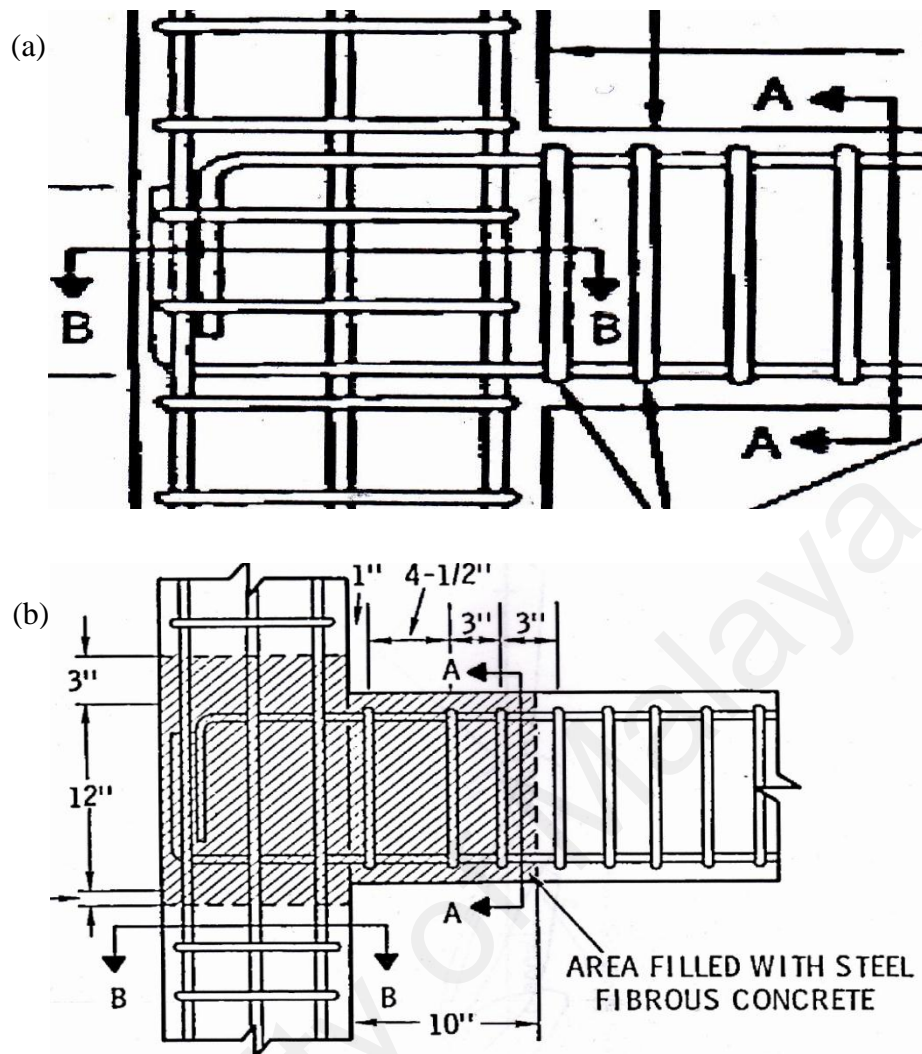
Beam-column joint (a) constructed by normal concrete and stirrups (b) replaced by steel fibrous concrete (Henager, 1977)
